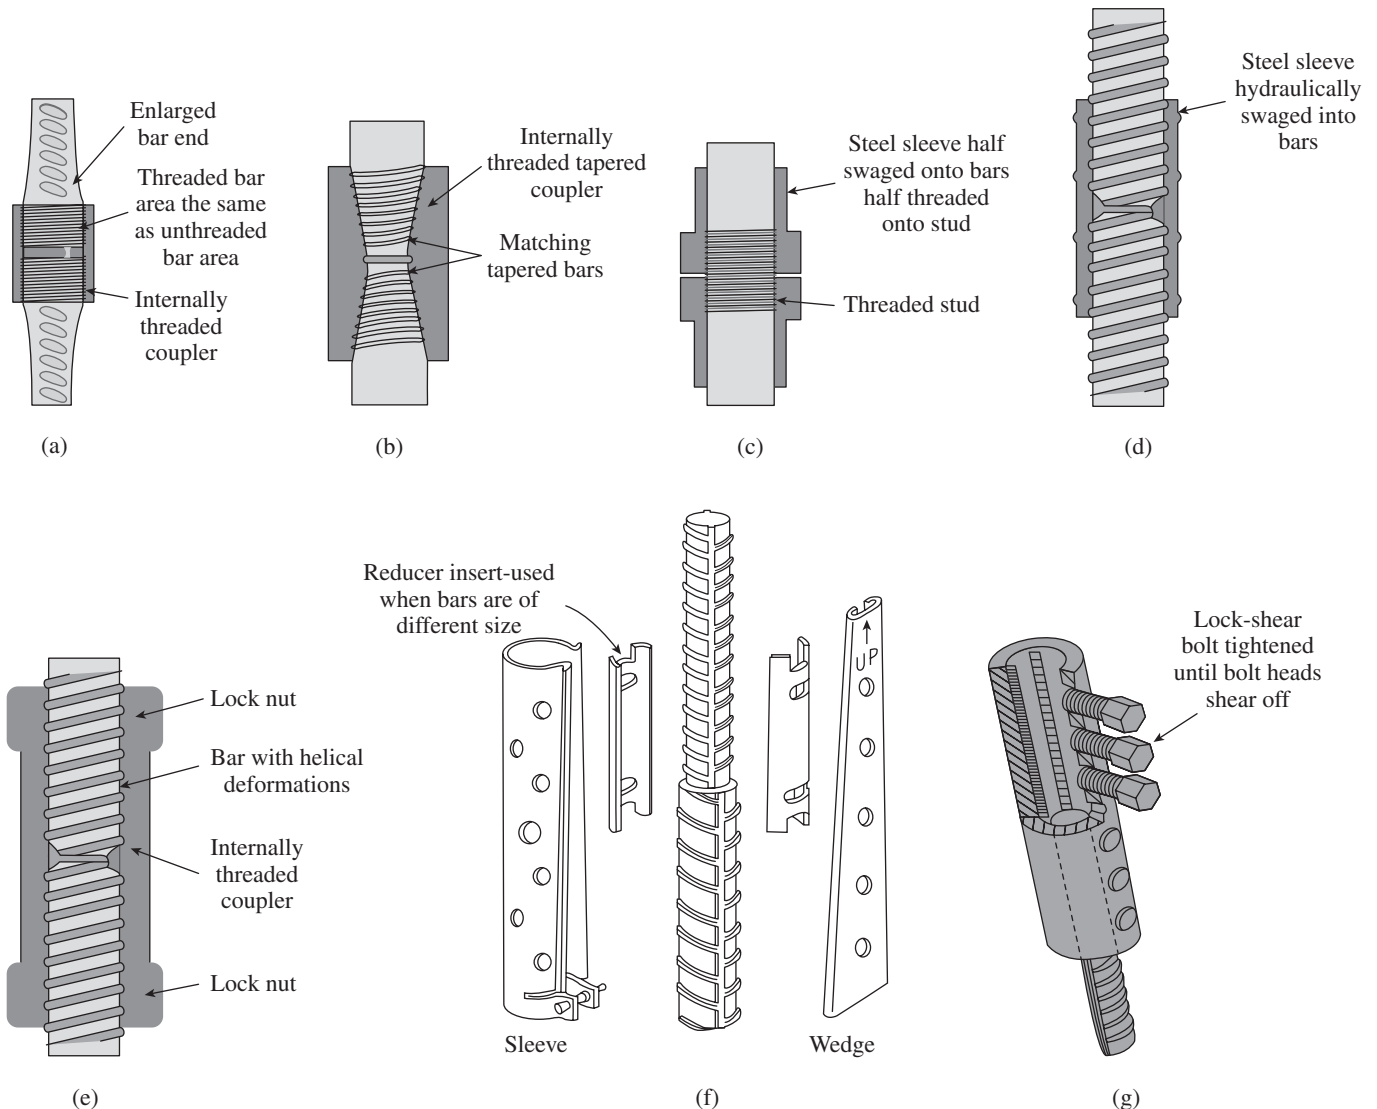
Types of mechanical couplers (a) Couplers with parallel threads (b) Couplers with taper-cut threads (c) Cold-swaged steel coupling sleeve with threaded ends (d) Cold-swaged steel coupler (e) Coupler with counter nuts (f) Wedge-locking coupling sleeve (g) Set screw couplers
